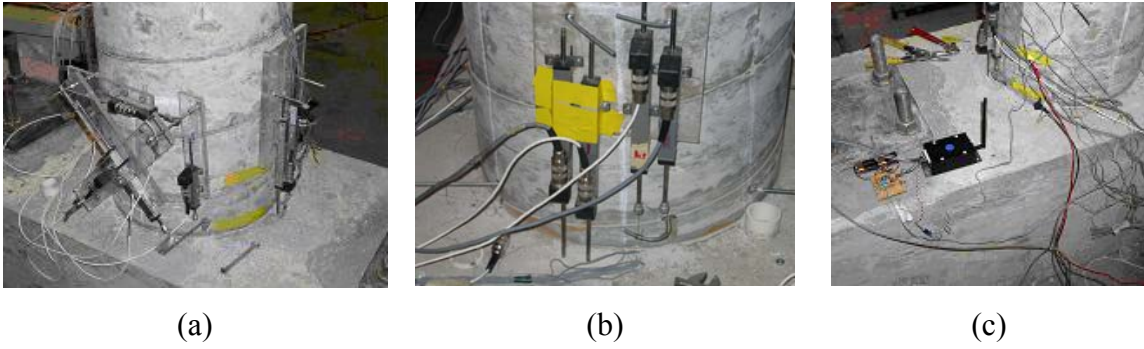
(a) LVDTs instrumentation at the pier base, (b) two LVDT pairs mounted to the front and back pier faces, and (c) a wireless sensing unit mounted to the top of the concrete support pedestal.
